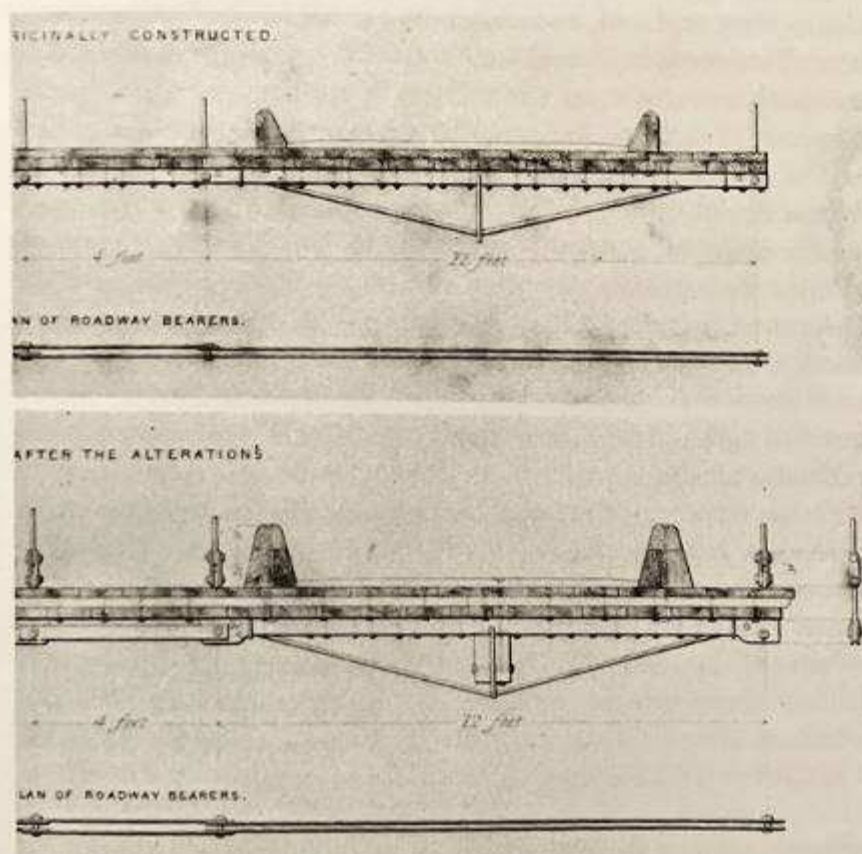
Part of cross section of original deck and heavier pin-jointed deck of 1839-93. (Maude, ref. 18, plate 17)
